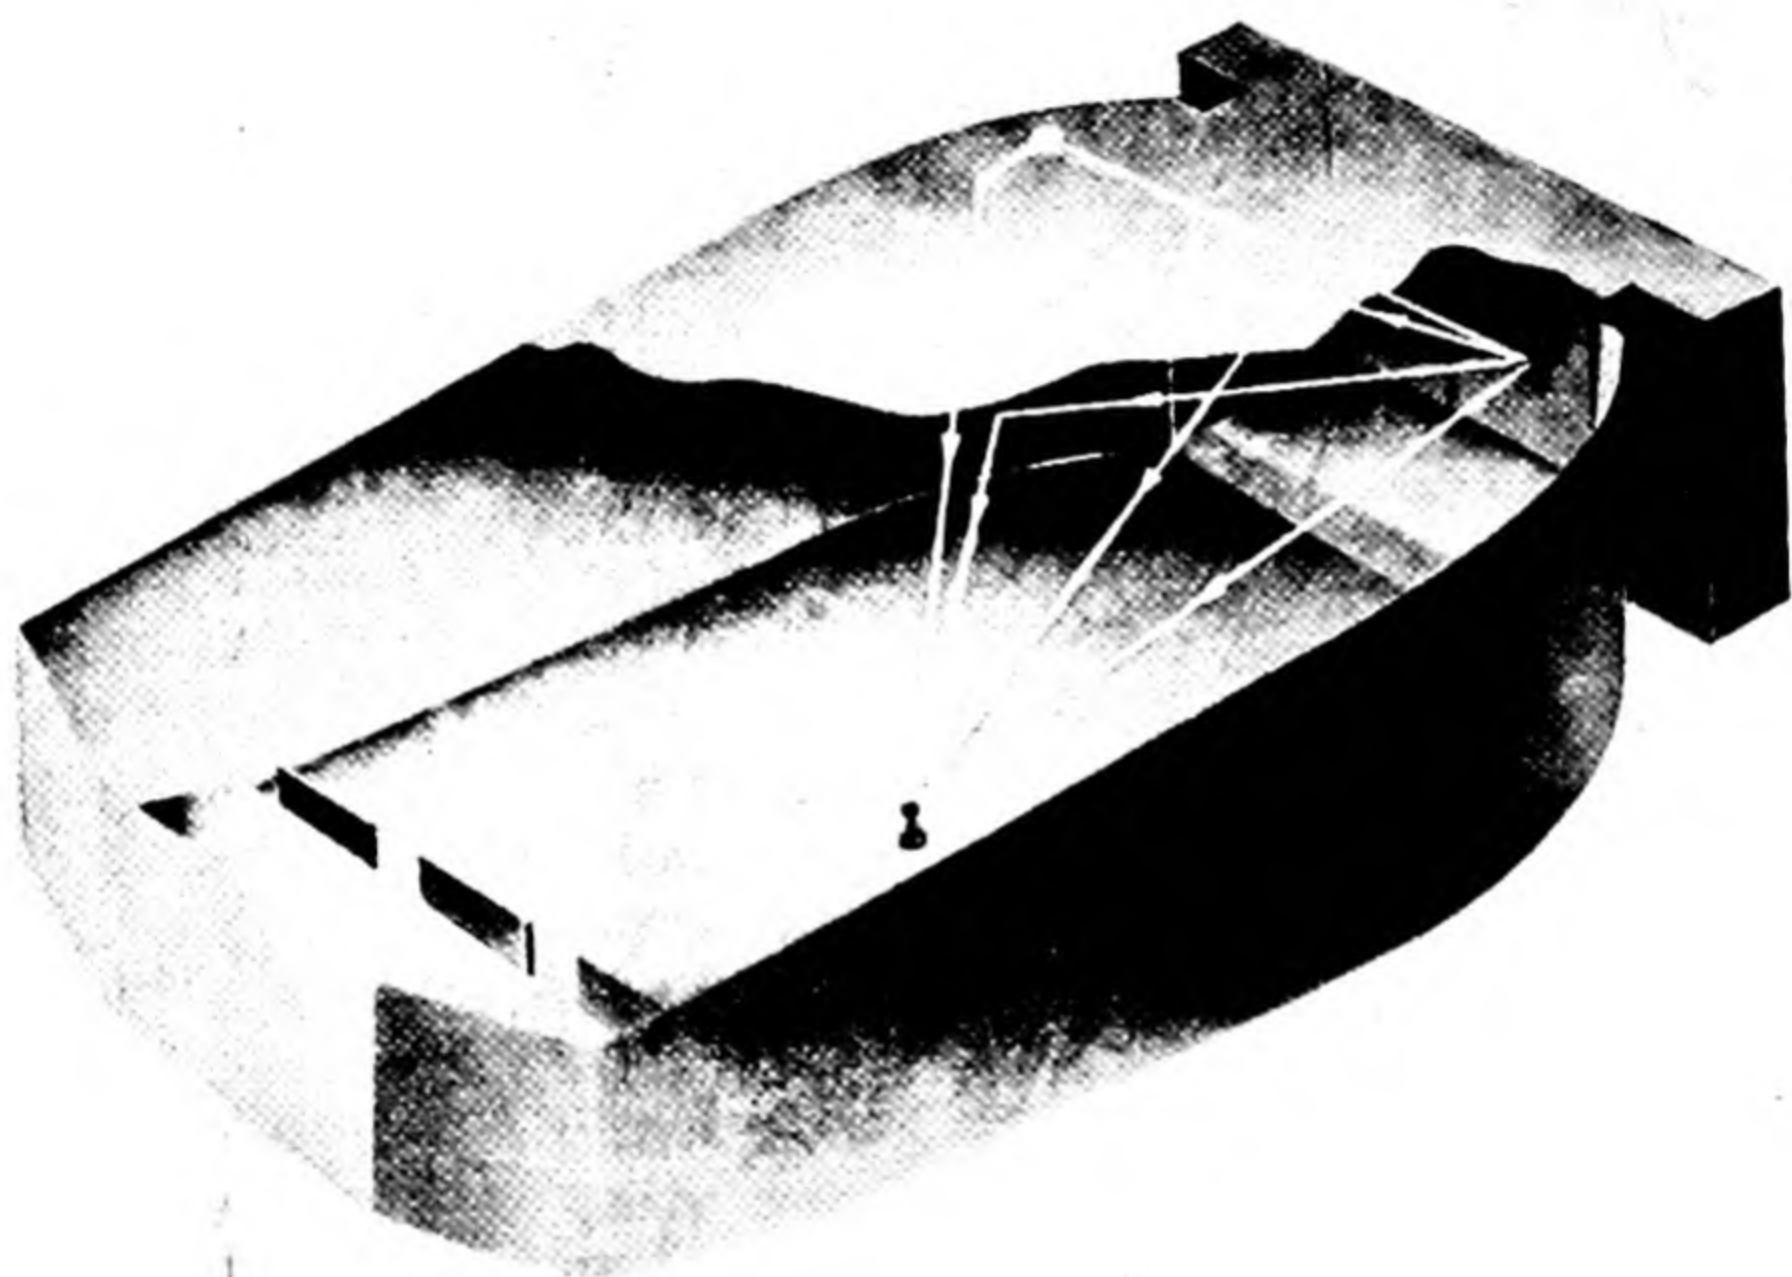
Plan and elevation of theatre of good acoustical design.
